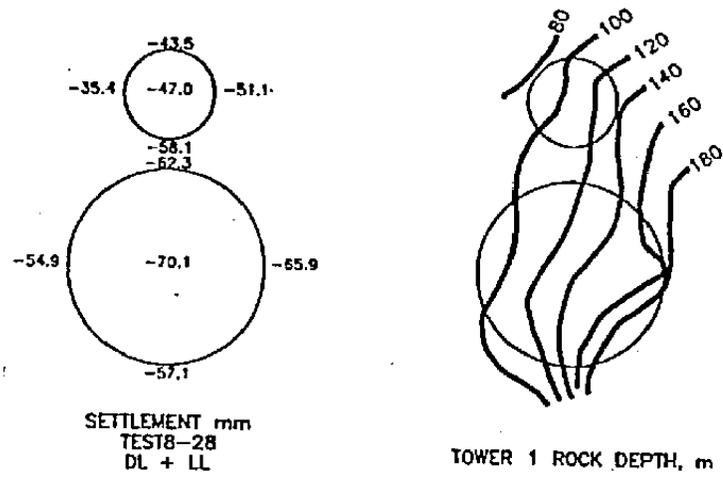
Tower 1 Settlement Map and Rock Contour Plan
